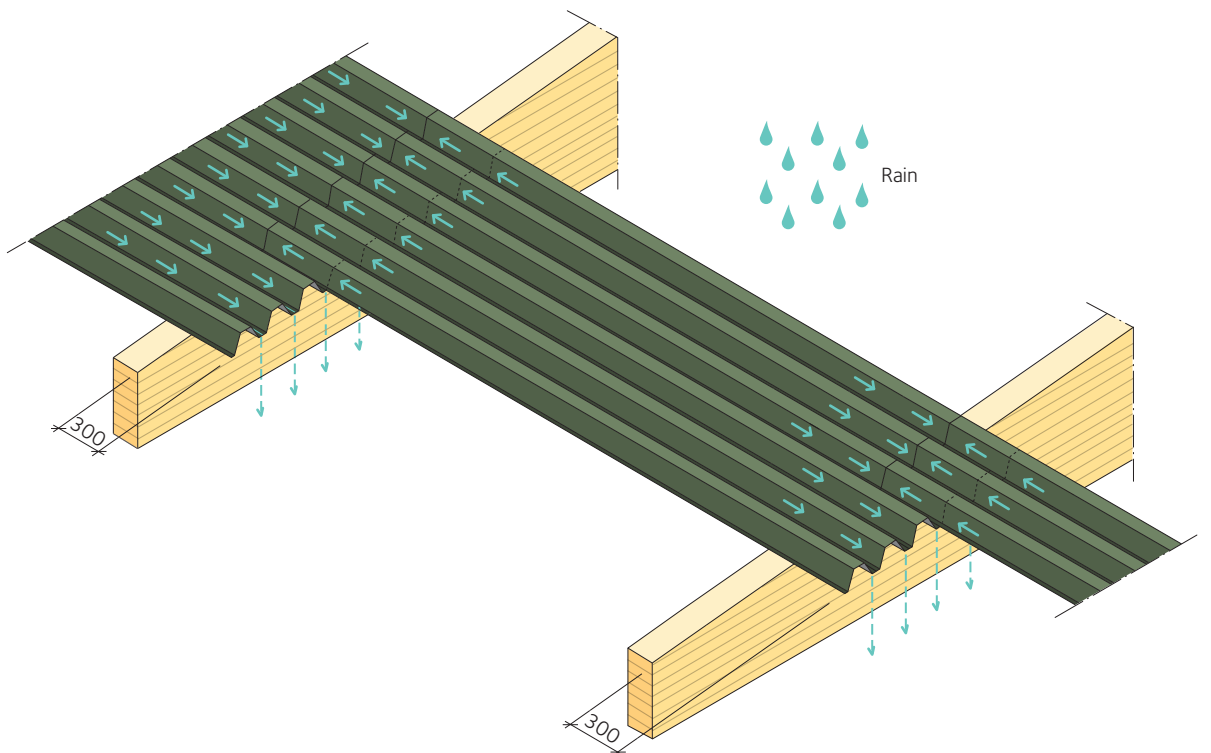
The corrugated roofing is installed so that the lower sheet overlaps the glulam roof beam by 300 mm to prevent water from discolouring the beam
